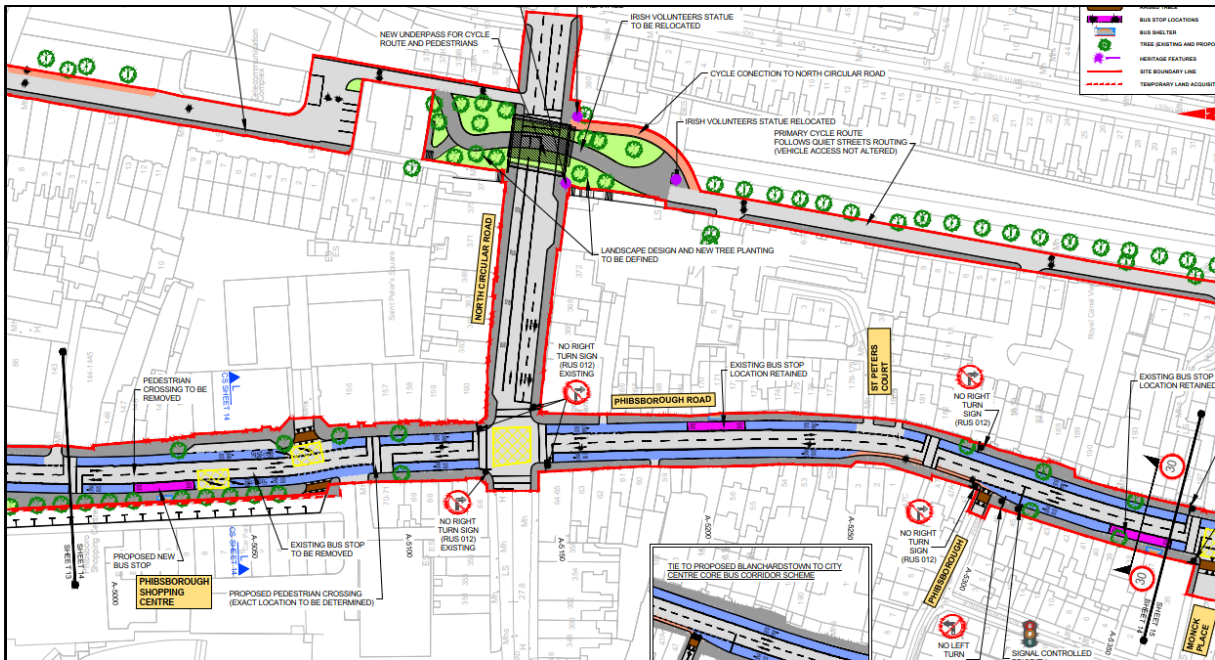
Extract from General Arrangement Drawing Sheet 14
